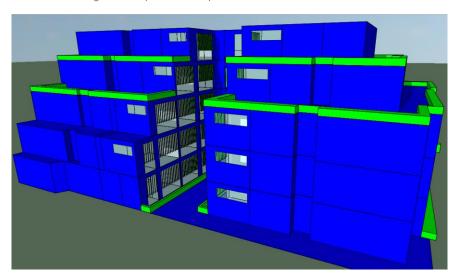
Proposed development model, Stair detail elevation to bedrooms
